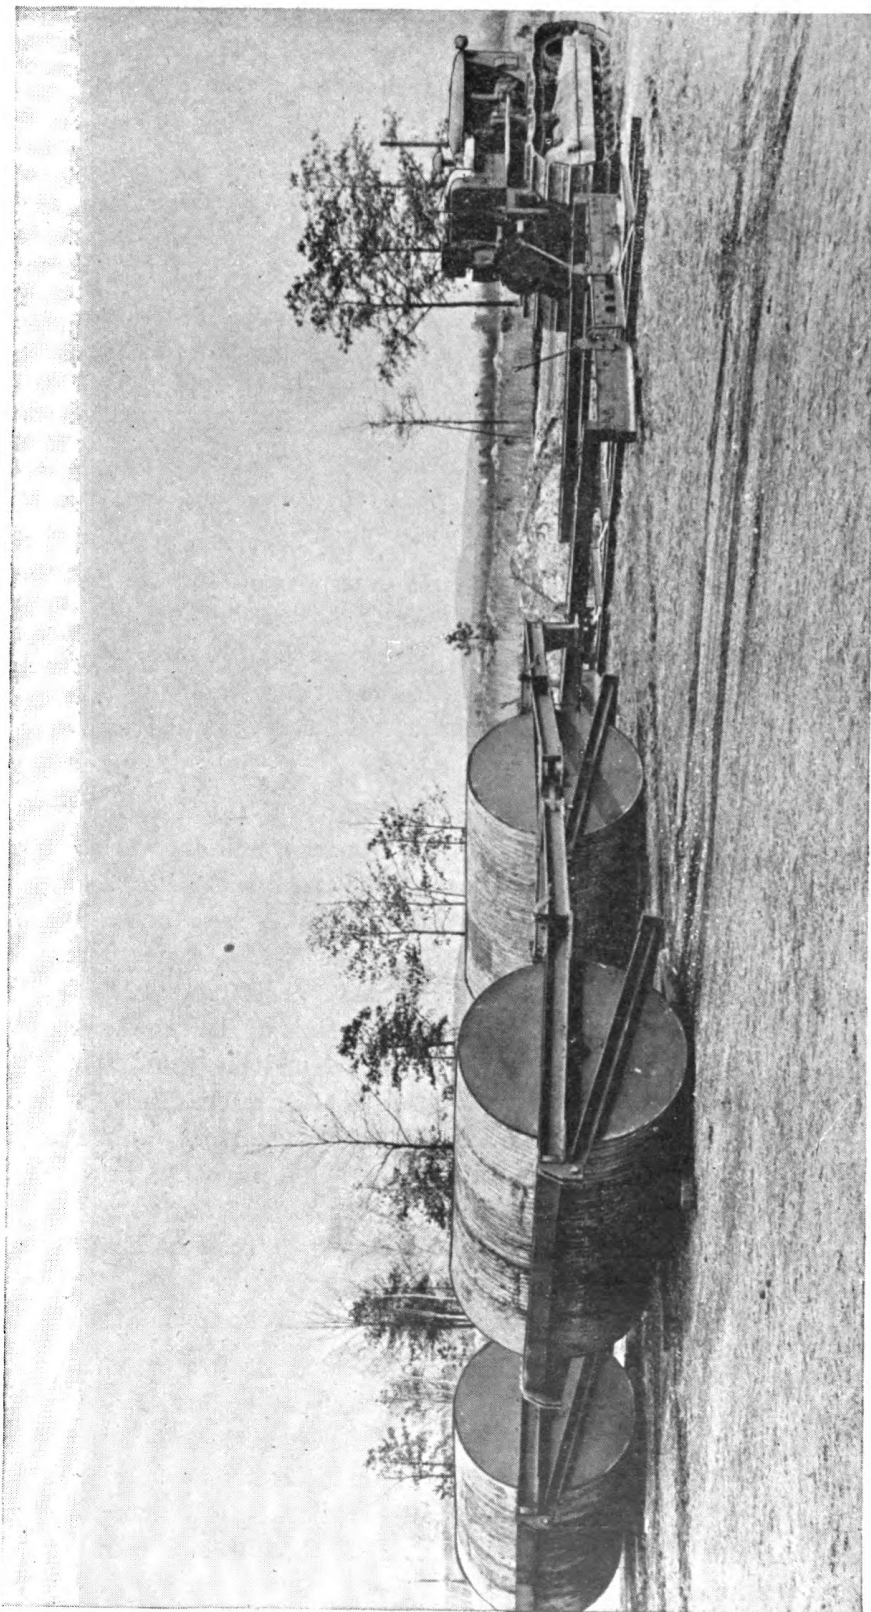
Rollers for packing snow, and drag with metal-cutting edges.
